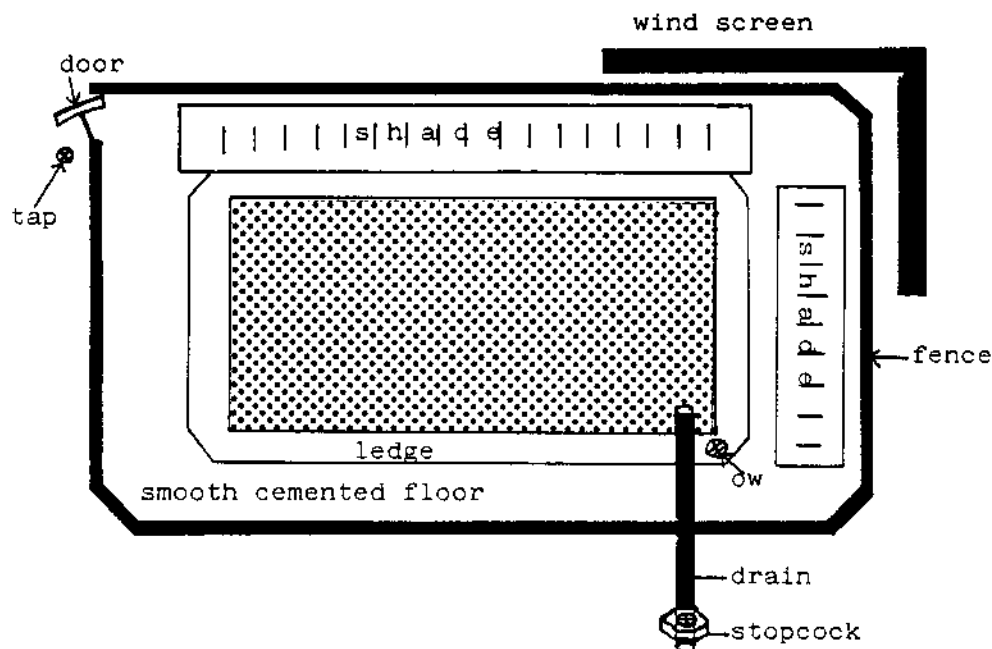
Single-Unit Cement Rearing Pond (Plan View)
